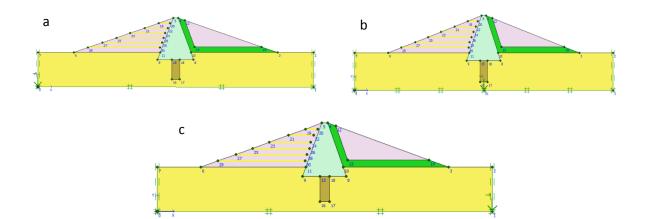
Effects of earthquake loading on earth dam with geotextile layers, a: upstream, b: below the core of earth dam, c: downstream.
